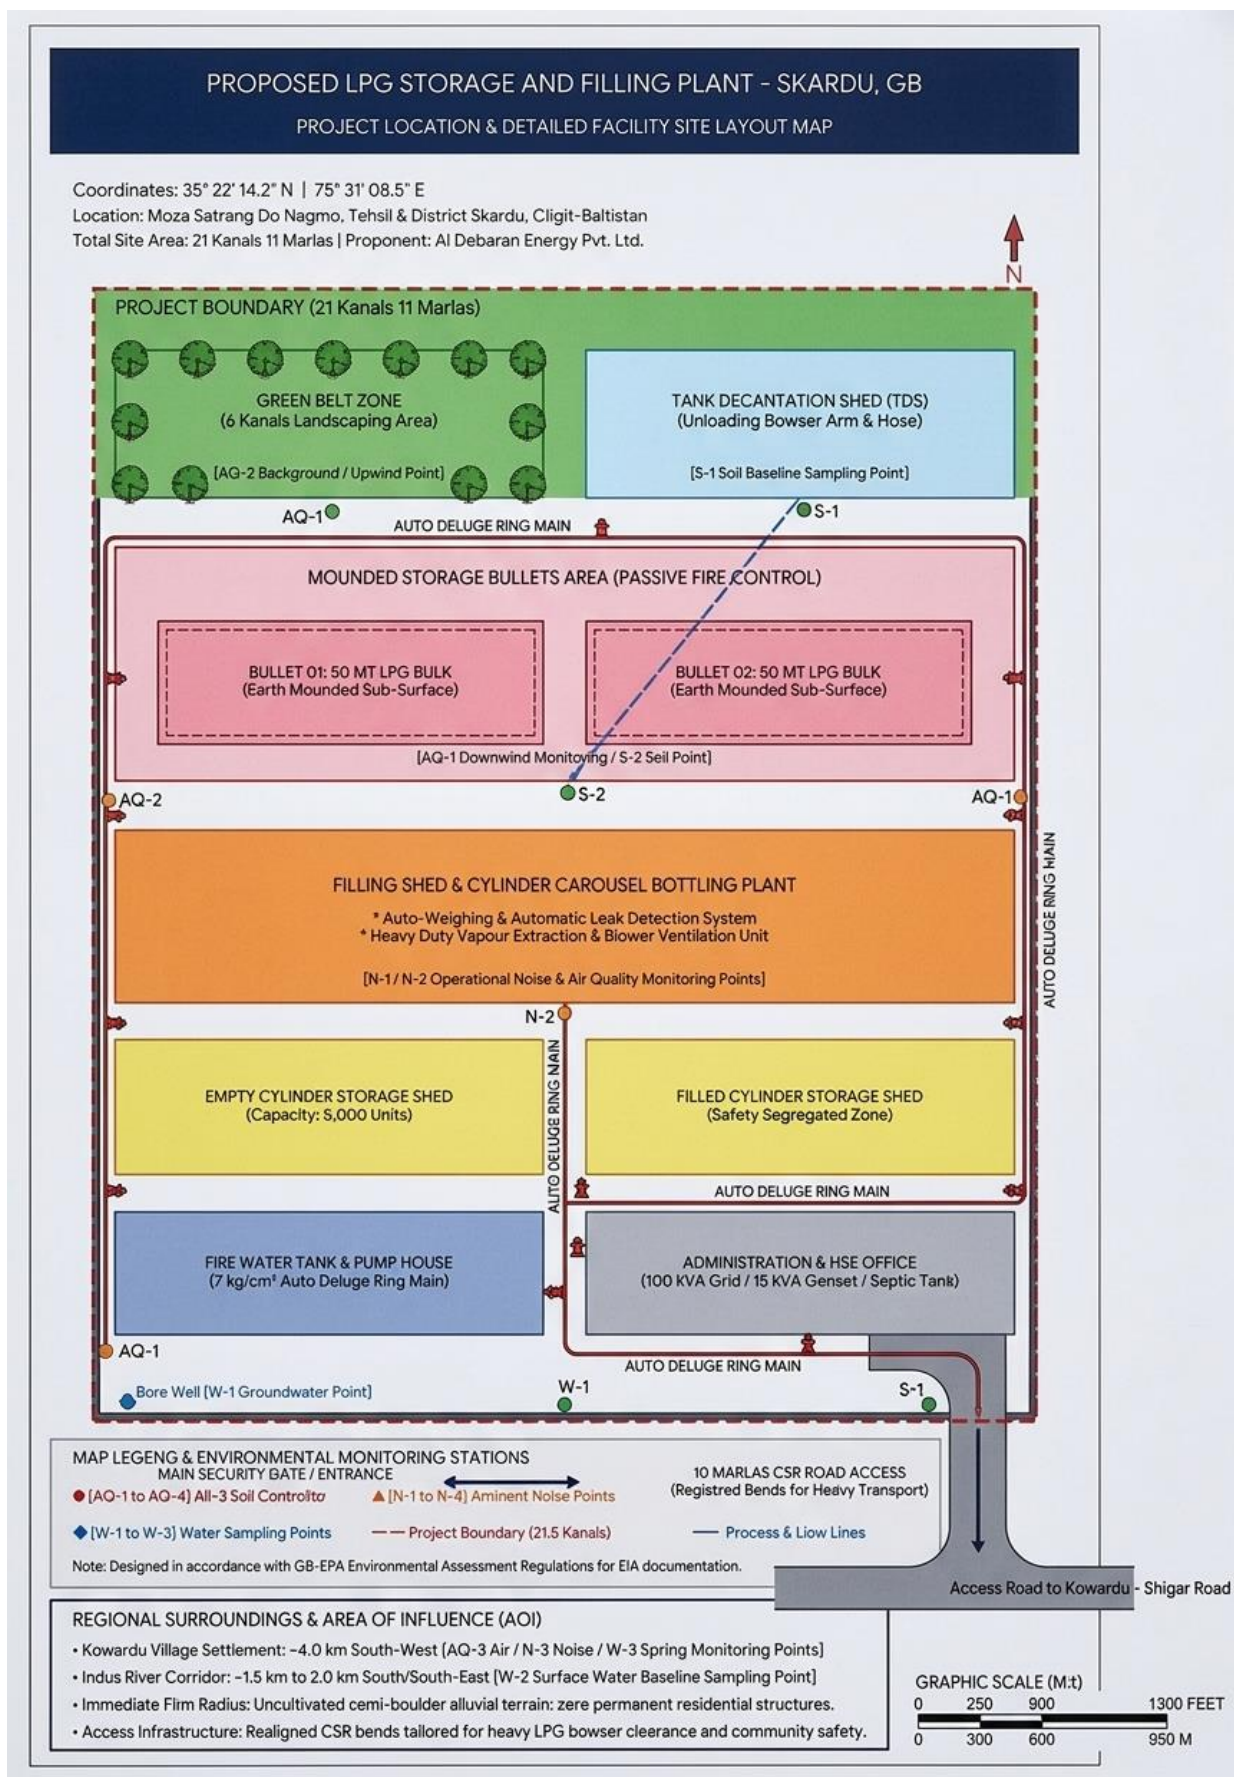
Detailed CAD-style site layout plan displaying exact building dimensions, safety clearance distances, mounded LPG storage bullets, cylinder carousel bottling plant, decantation shed, fire water deluge system, and peripheral green belt buffer.
